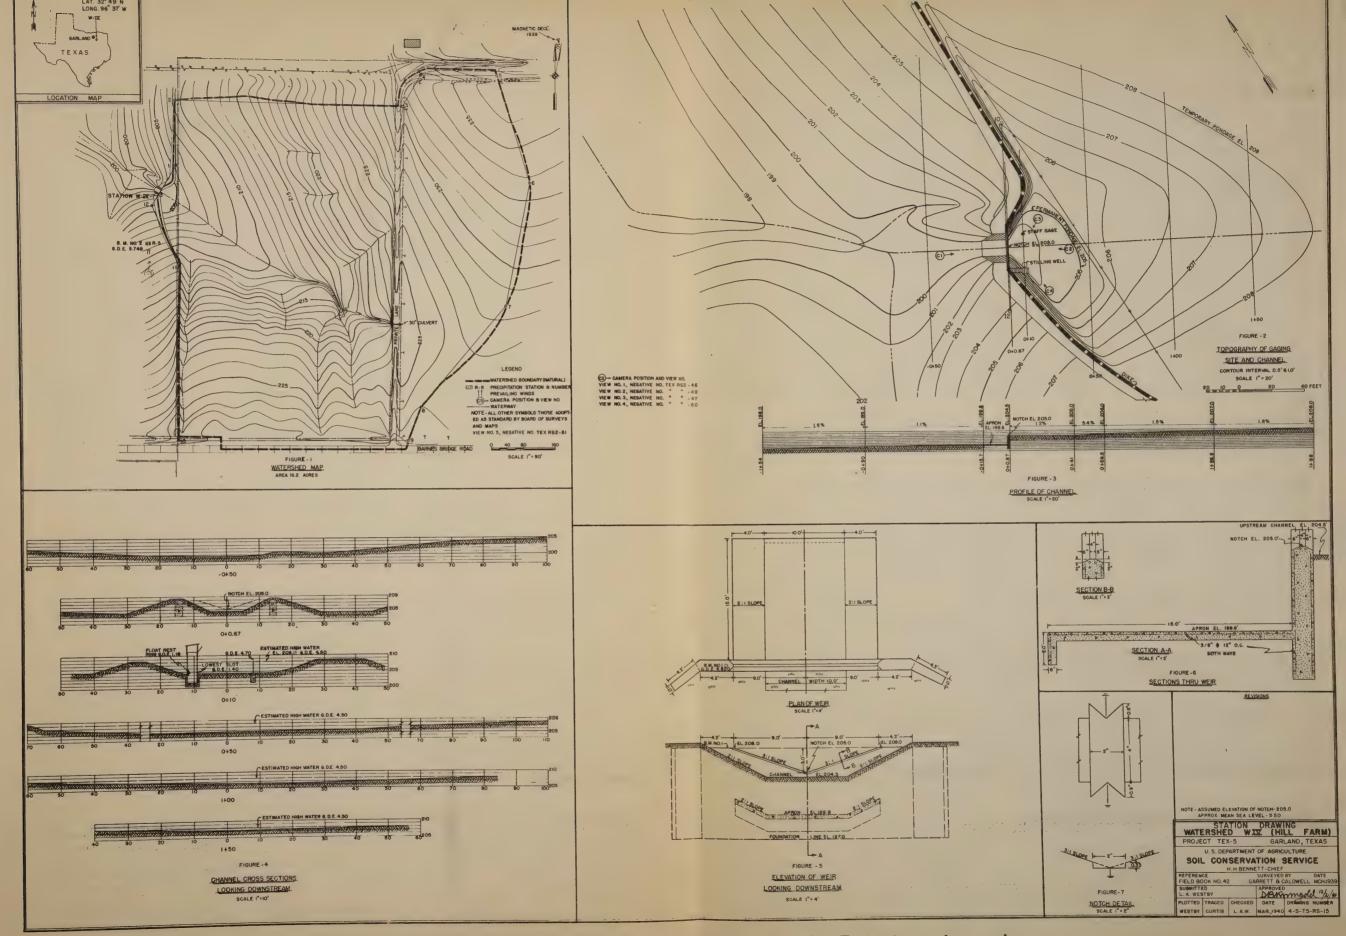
Plan and construction details of a 3:1 triangular weir.
